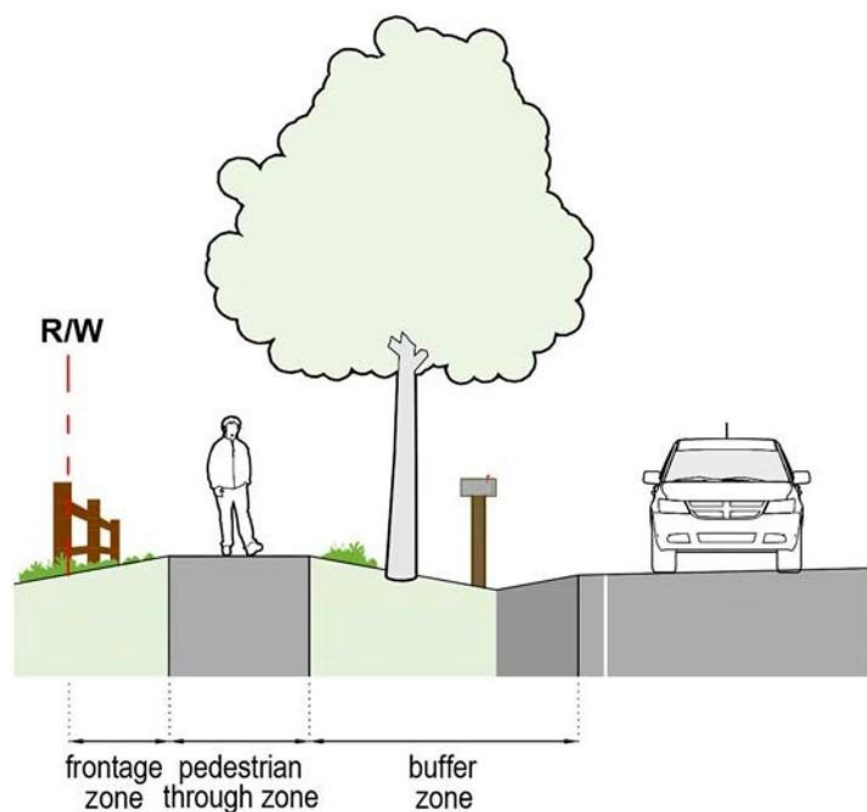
Uncurbed Roadway Where No Sidewalk Is Provided
